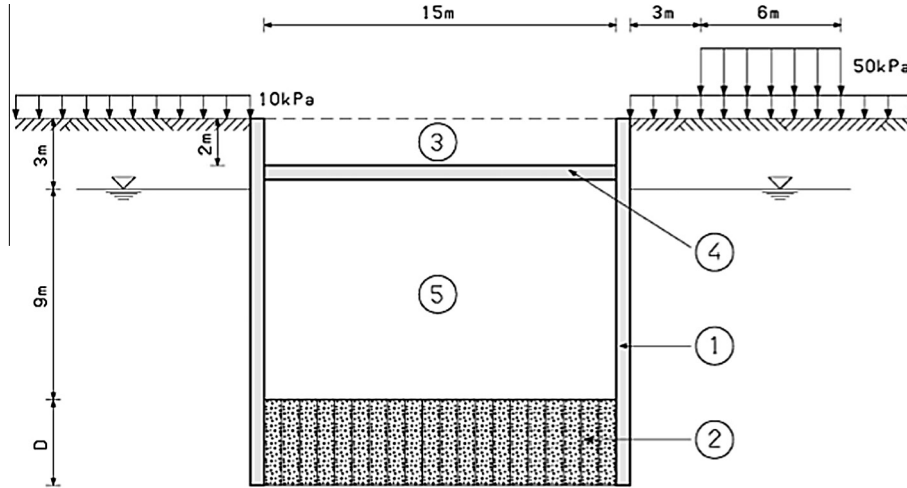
Scheme of the shallow excavation supported by two diaphragm walls.
